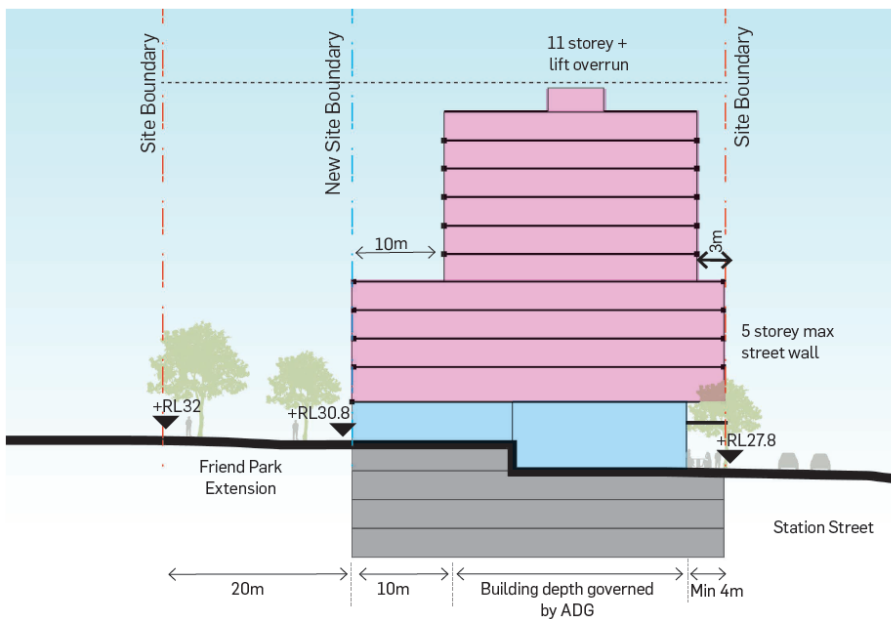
Section B-B through corner of Pritchard Street and Station Street Precinct (typical east-west tower section)
